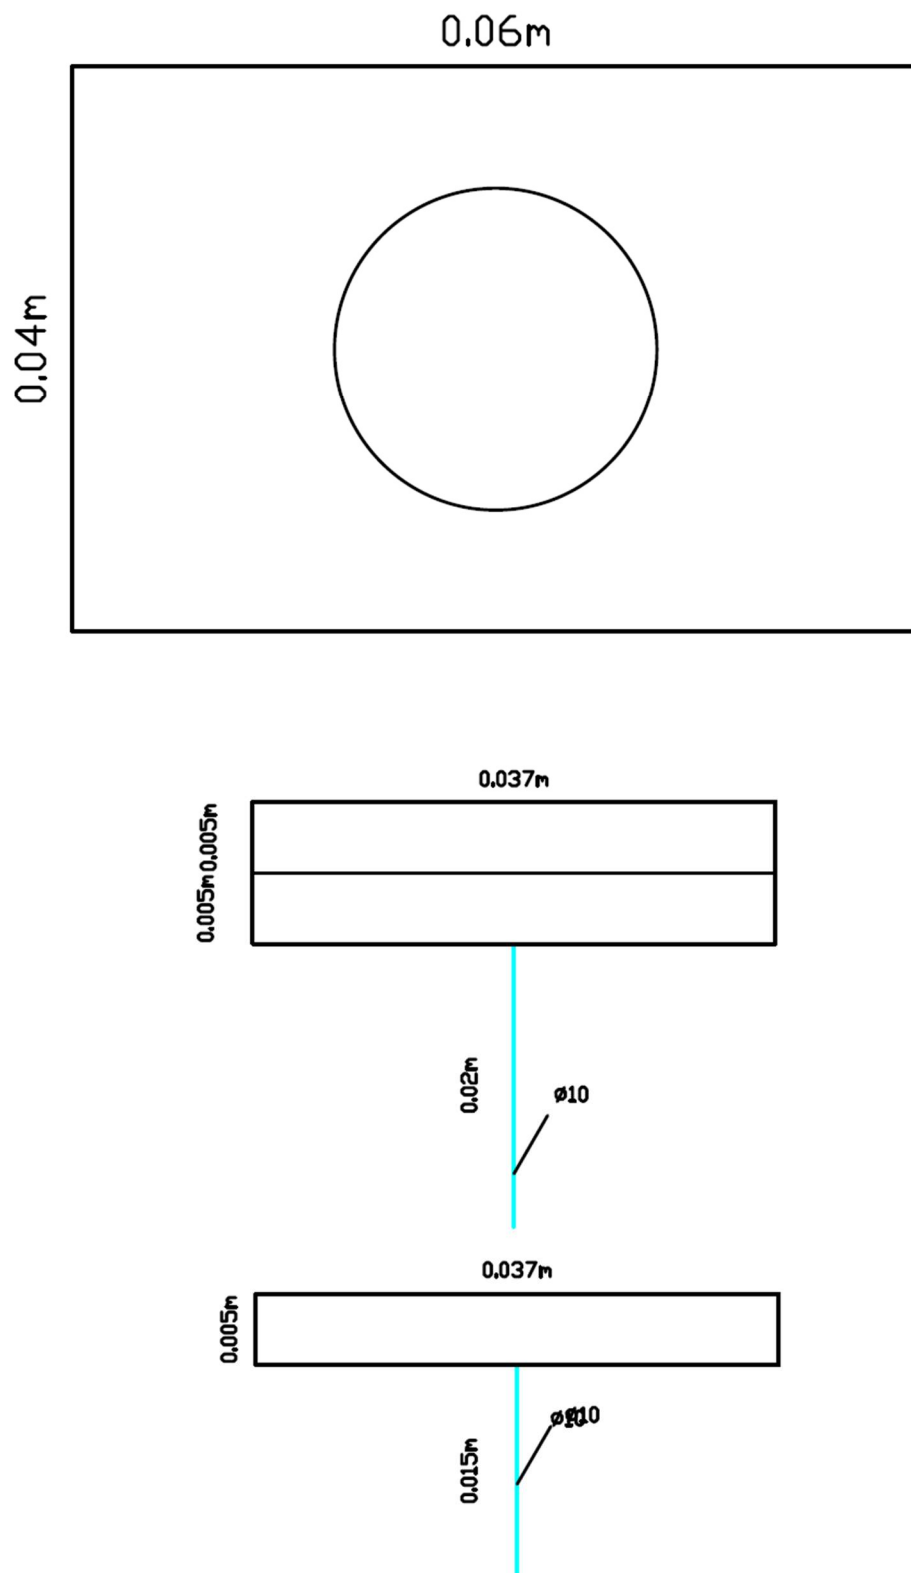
Anchoring details and PU pads dimensions (under the top slab)
